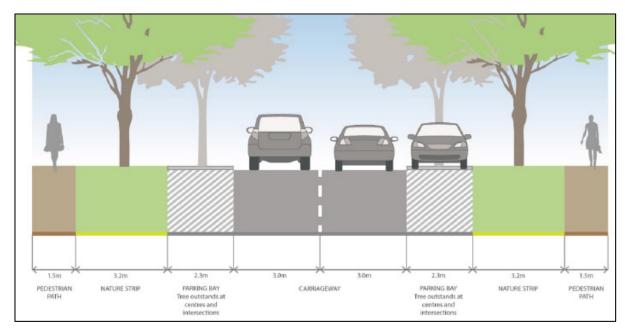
Local Access Street Level 2 Cross-Section (20m)
